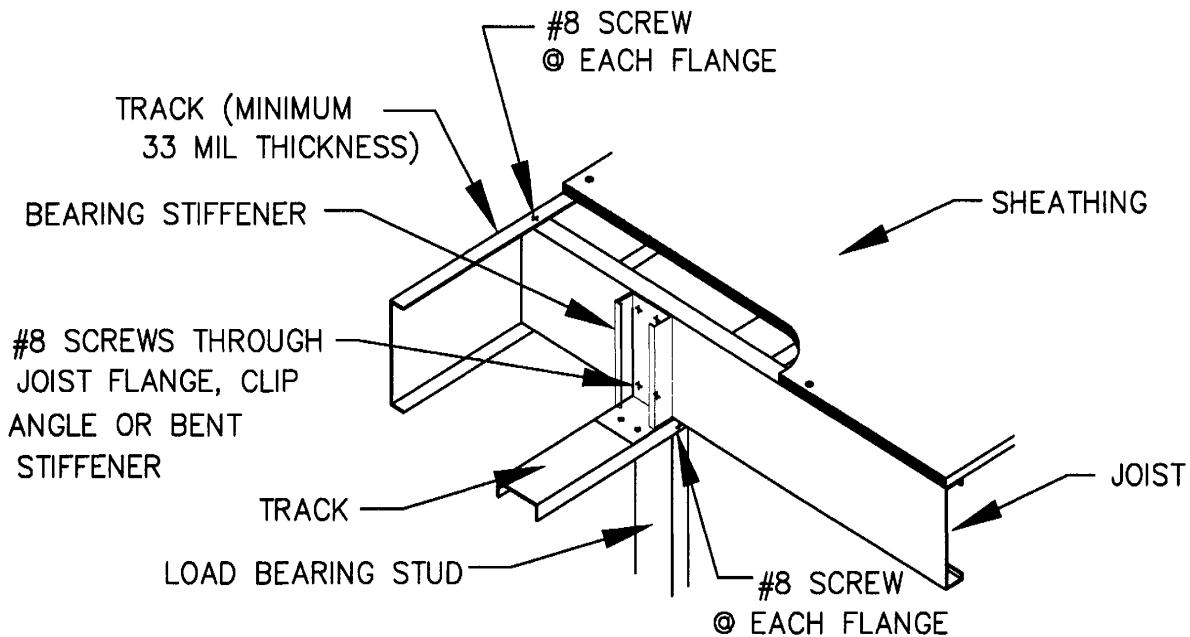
Cantilevered Floor to Exterior Load Bearing Wall Connection
